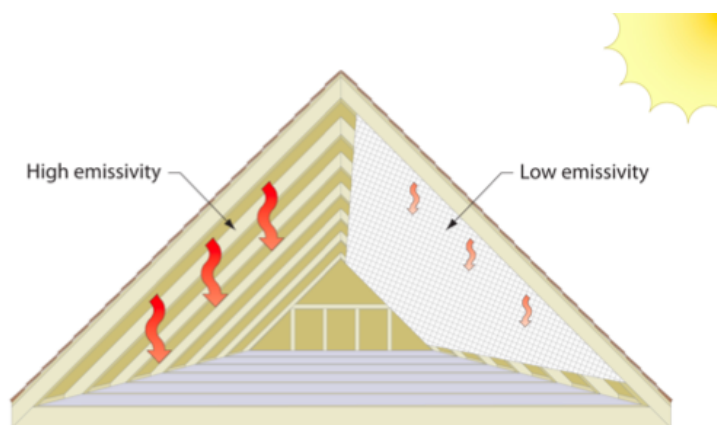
Typical radiant barrier installation at roof framing (U.S. Department of Energy 2010).
